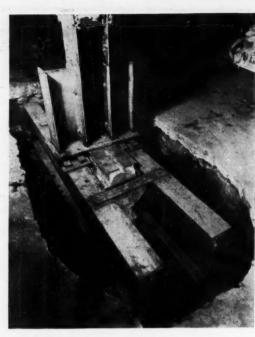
SIX INTERIOR COLUMNS of Building 8 were underpinned with 12-in. Tuba steel cylinders driven by pile hammer, cleaned out with earth auger and filled with concrete.
